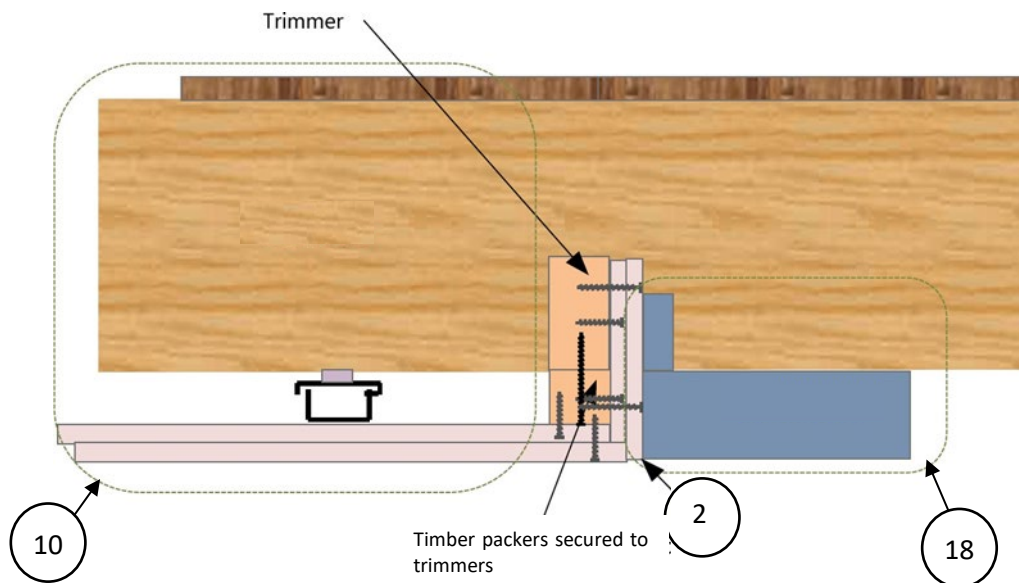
Framing out opening for access panels in a timber floor assembly – Section view
